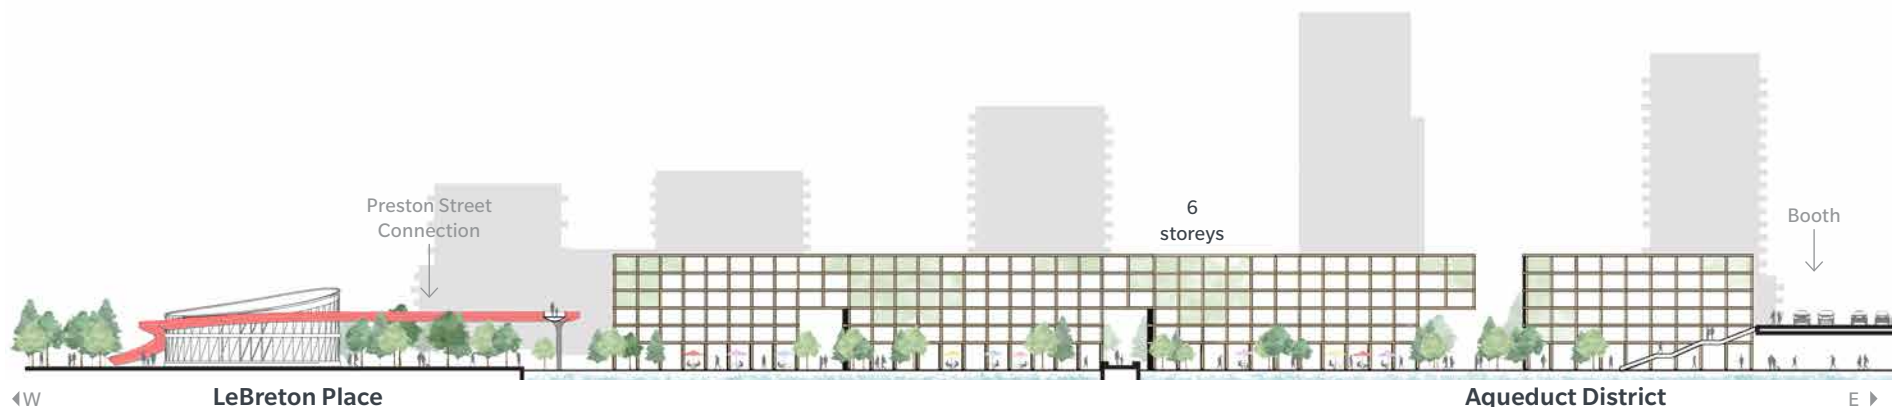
Sectional elevation (east to west) illustrating the Preston Street Connection and the Aqueduct District.
